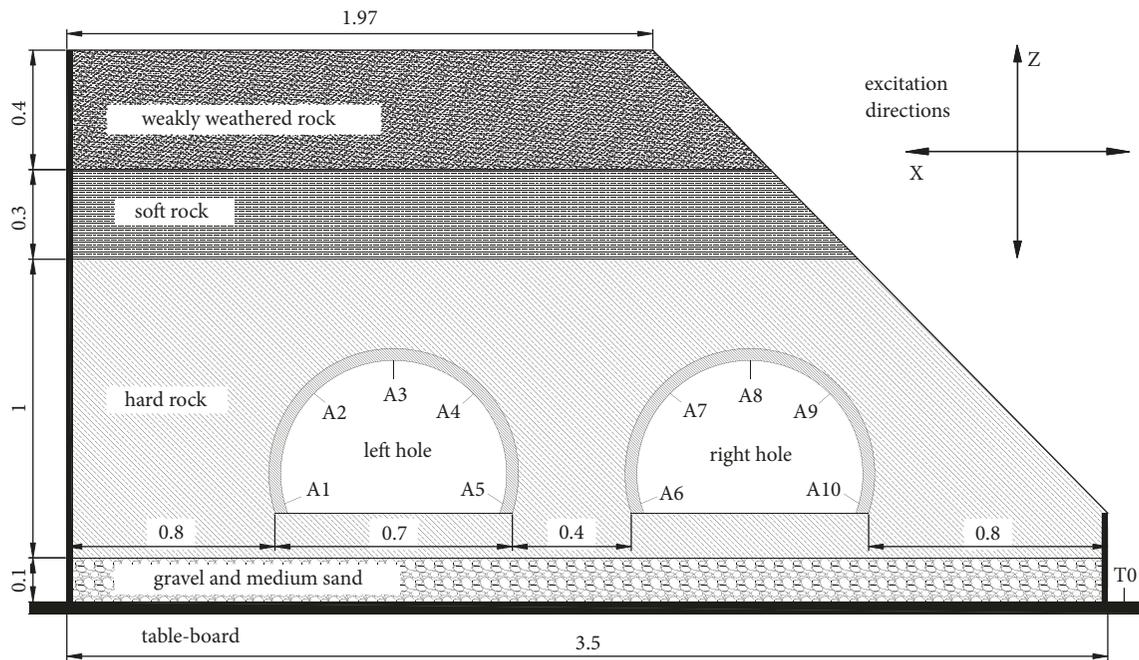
Surrounding rock and layout of transducers (unit: m).
